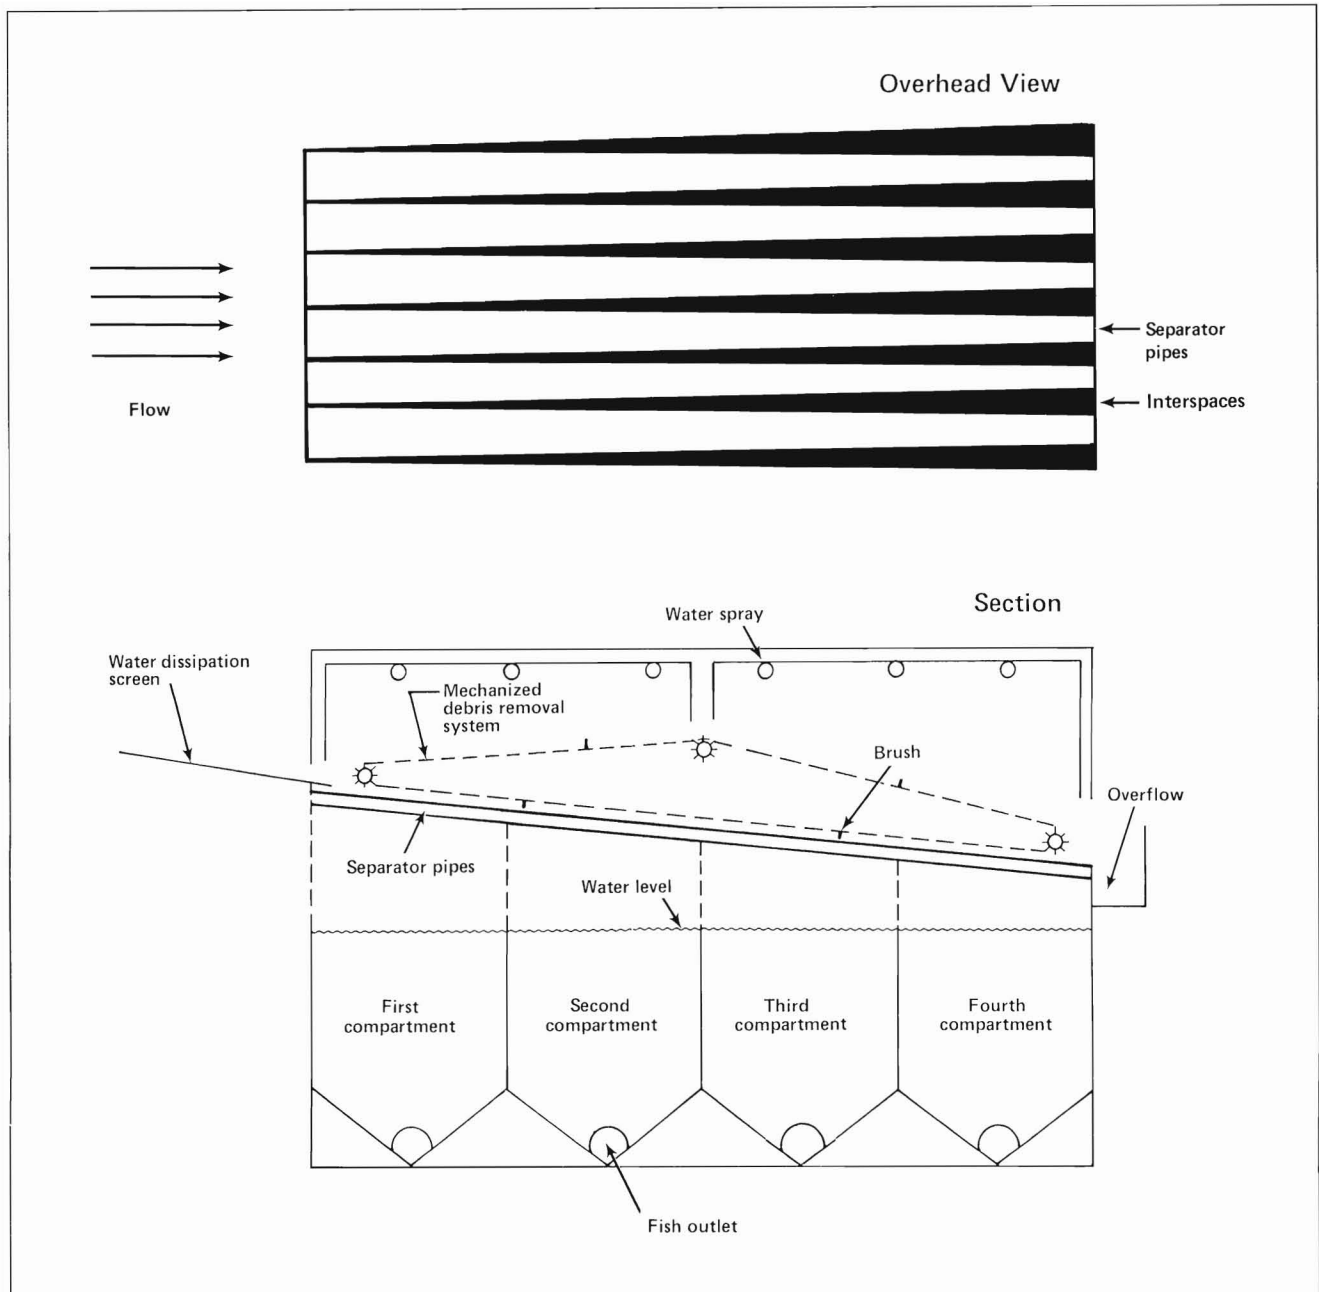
Side view of dry-type separators at collection facilities prior to 1982.
